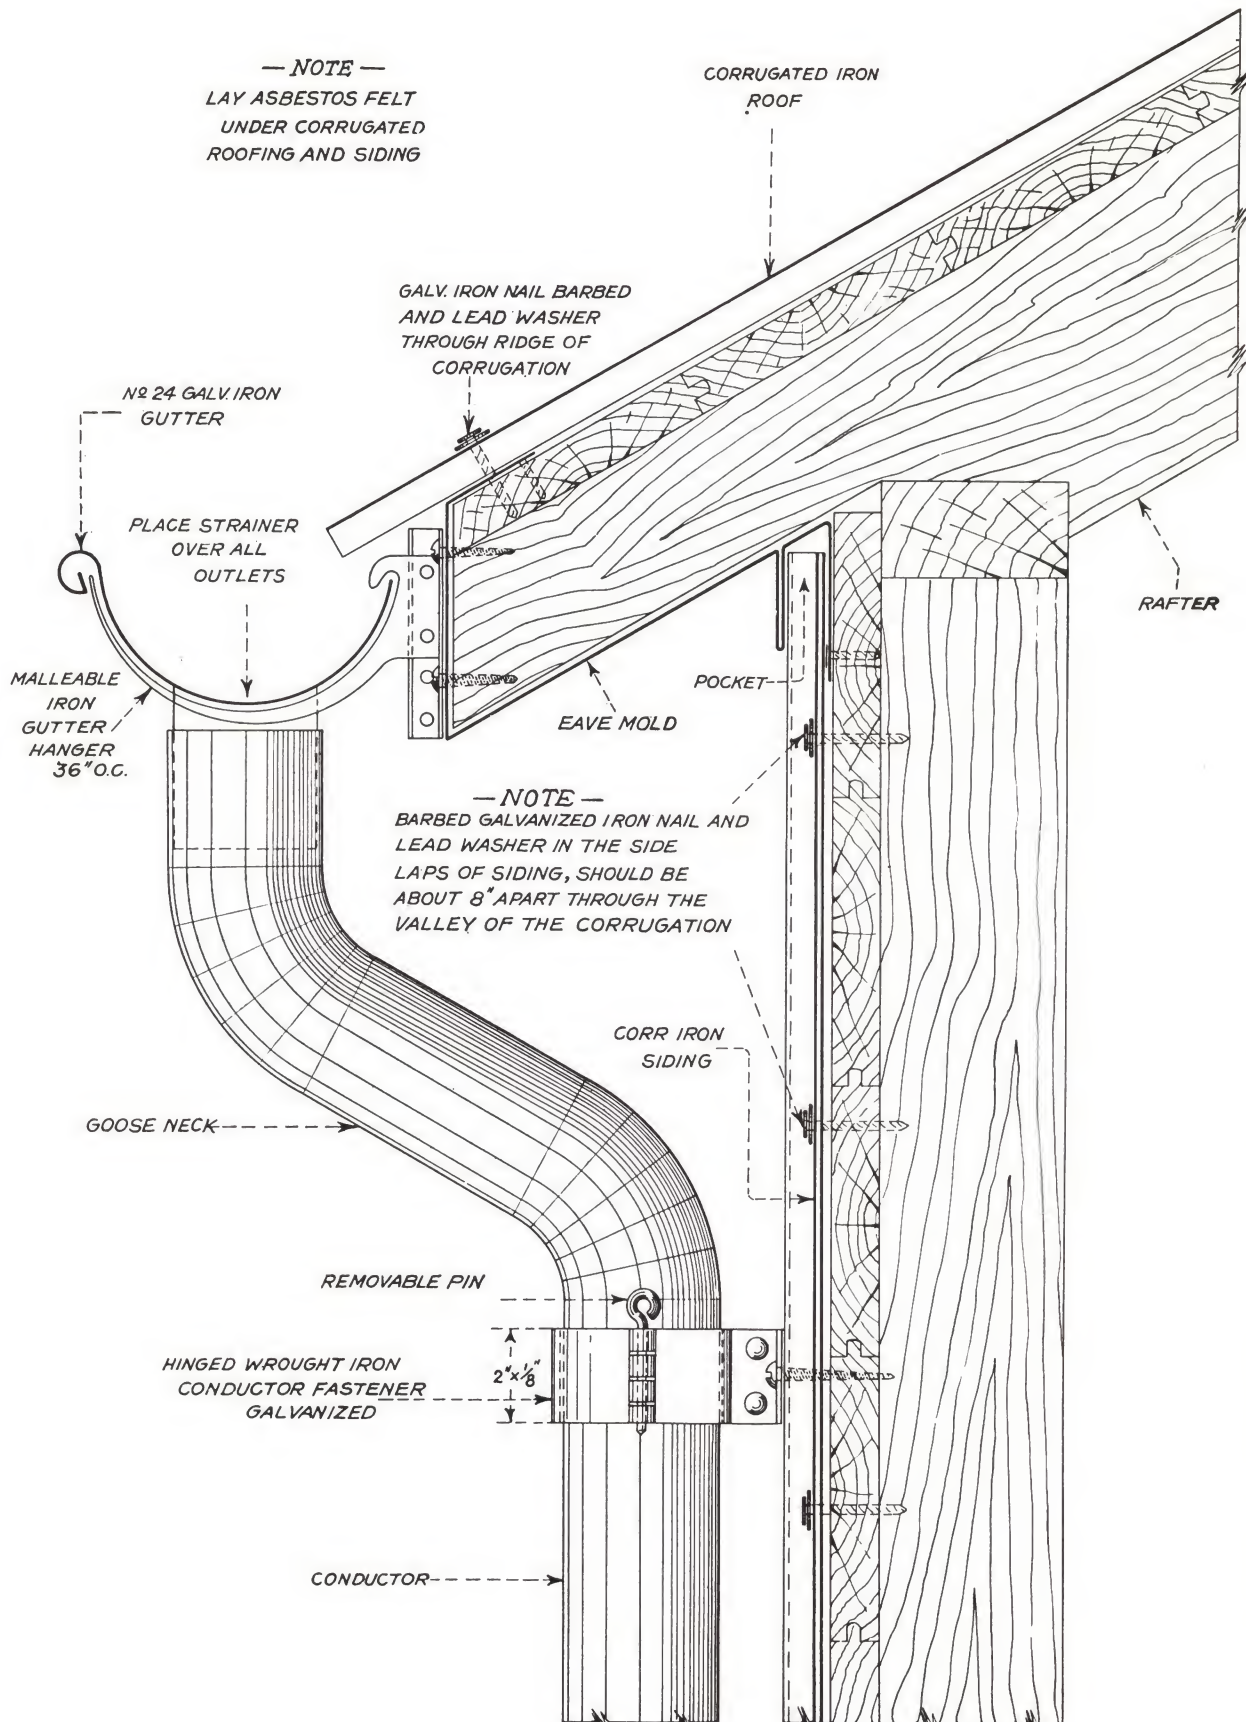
SECTION ON LINE D-D IN FIG. 2 ON DRAWING NO. 1
